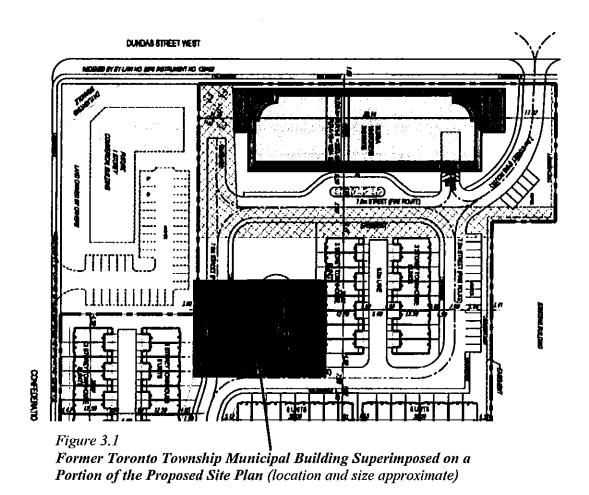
shows the approximate location of the Toronto Township Municipal Building on a portion of the proposed site plan for 100 Dundas Street West.
